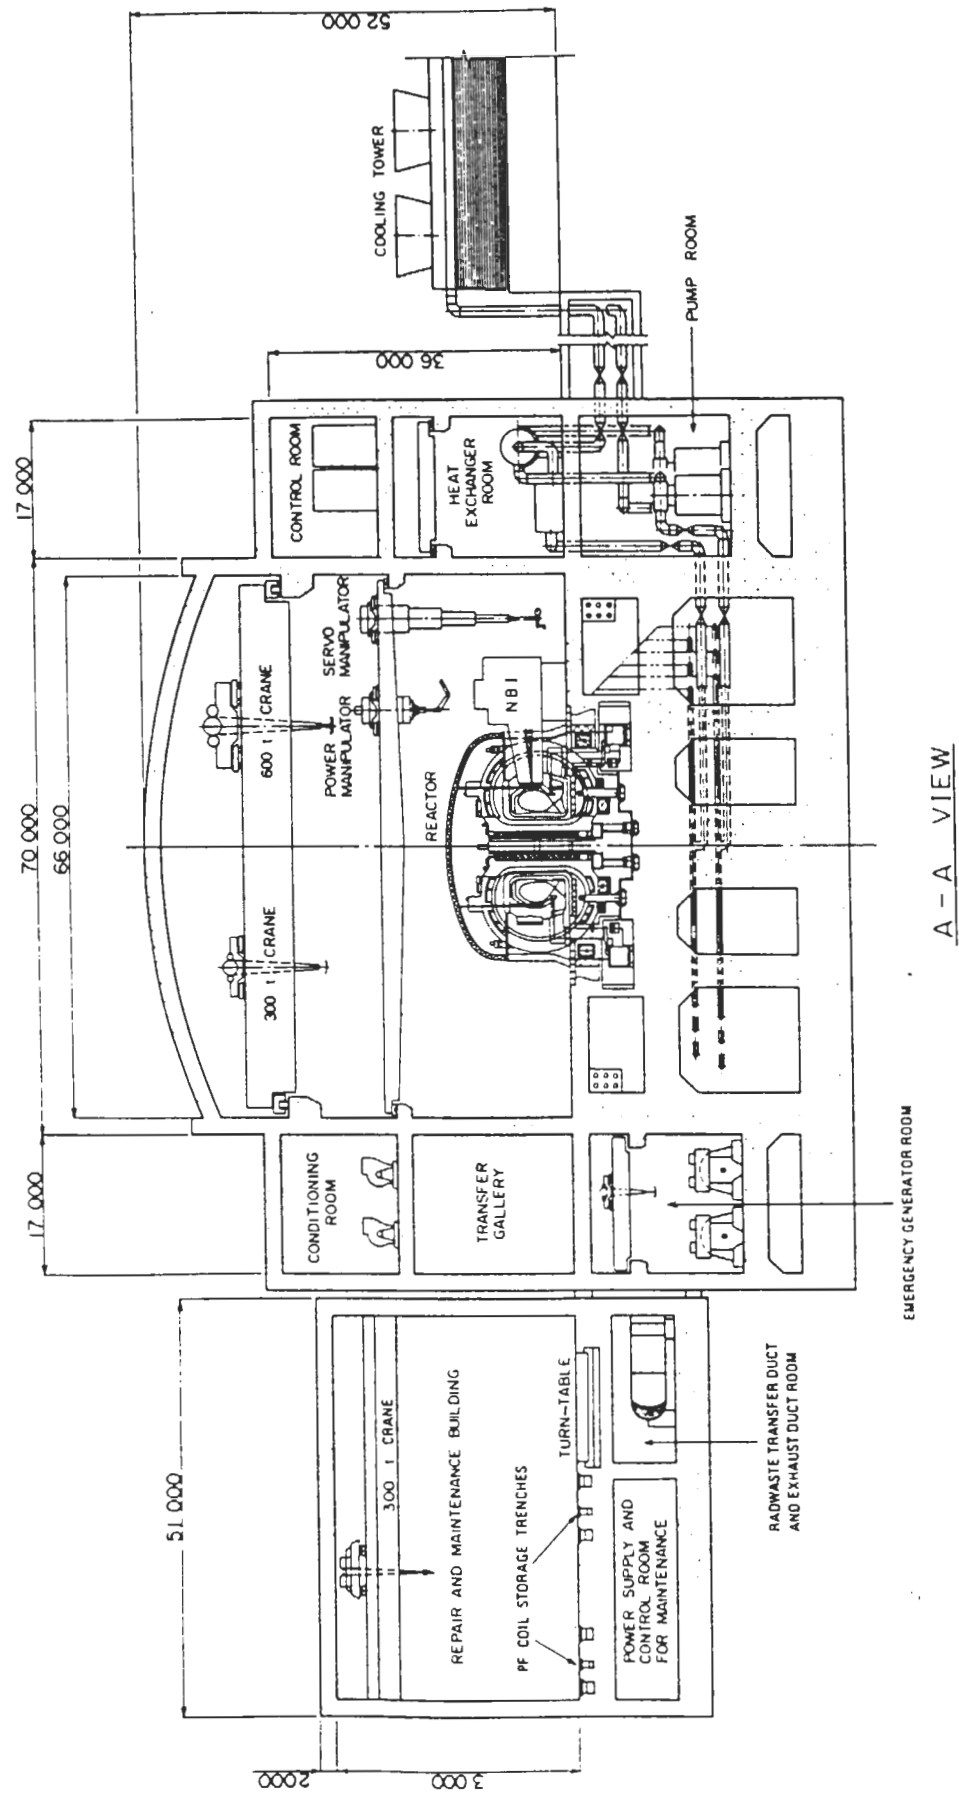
Cross-sectional elevation of the reactor building - section on A-A of Fig. 17.
